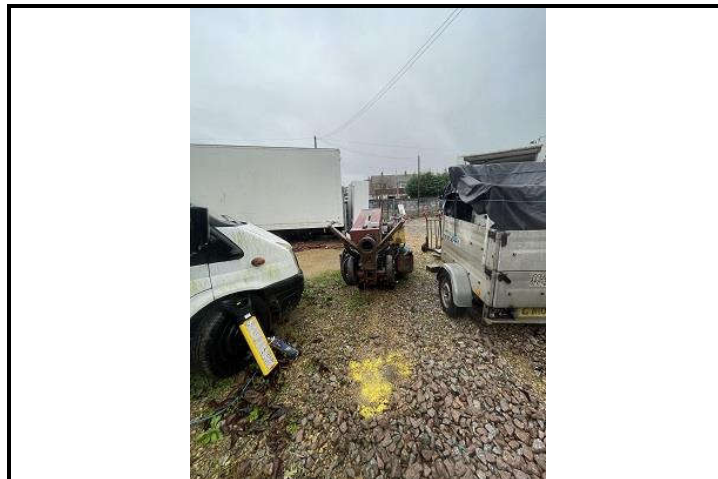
/1057/R3/P20 – Location and commencing surface at Window Sample WS3 – at the centre of the site.
